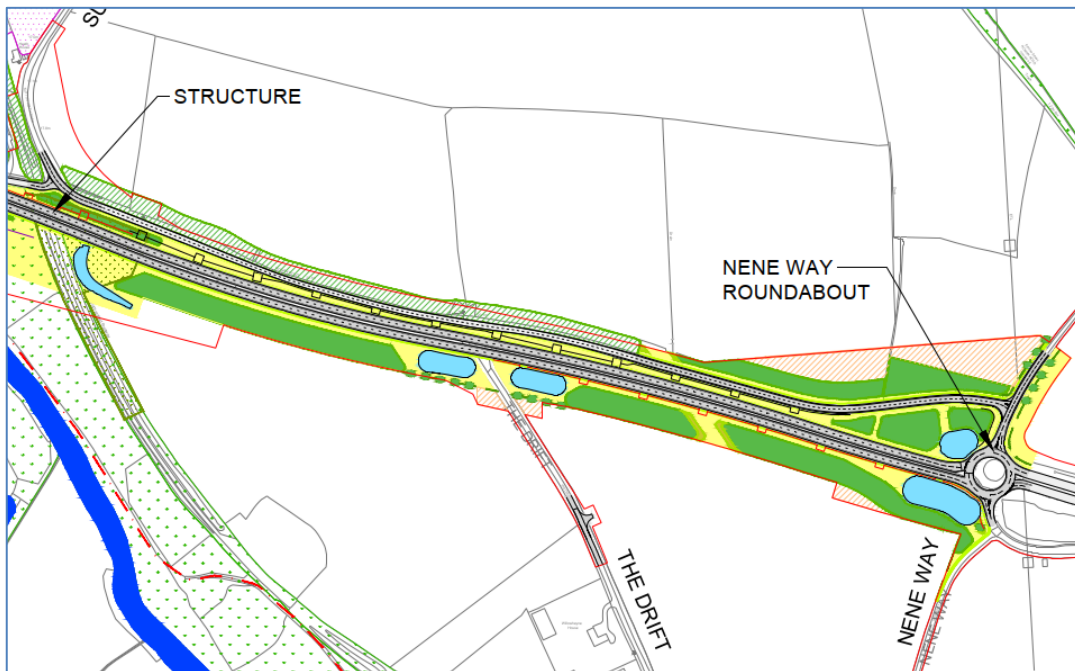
Proposed new roundabout was relocated to the existing location of the Nene Way Roundabout
